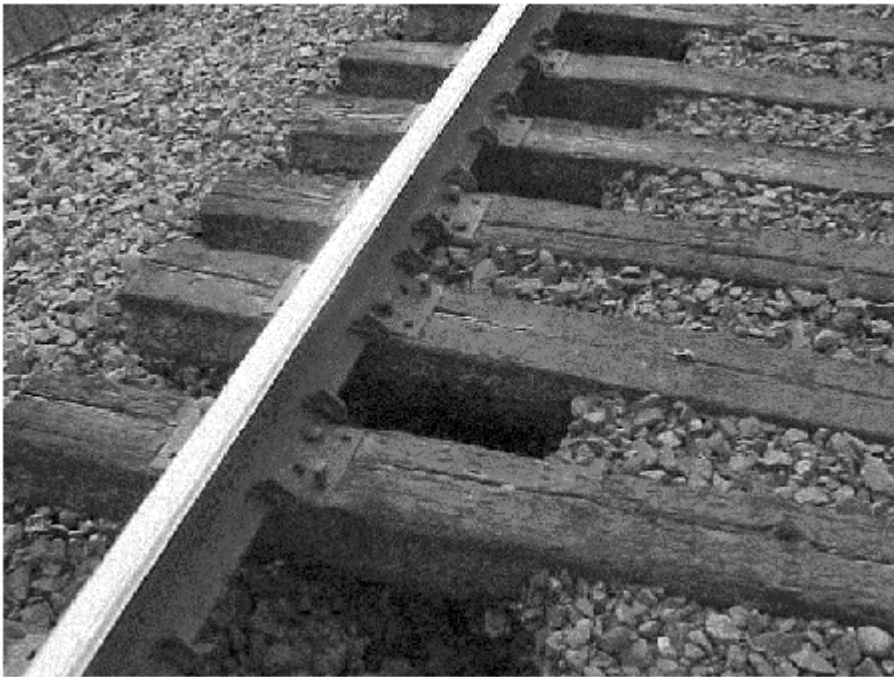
Ballast loss over pipe culvert at MP 30.92.
